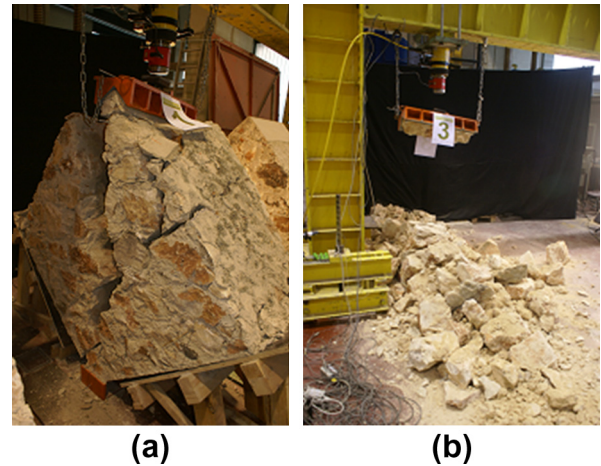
Collapse of masonry panels: (a) panel W1 made with hydraulic mortar; and (b) panel W3 made with air lime mortar.
